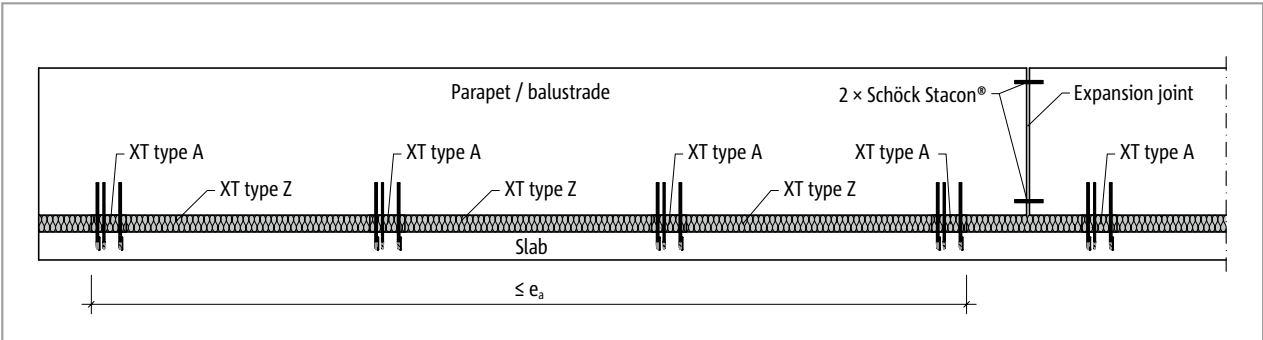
Schöck Isokorb® XT type A: Expansion joint arrangement
